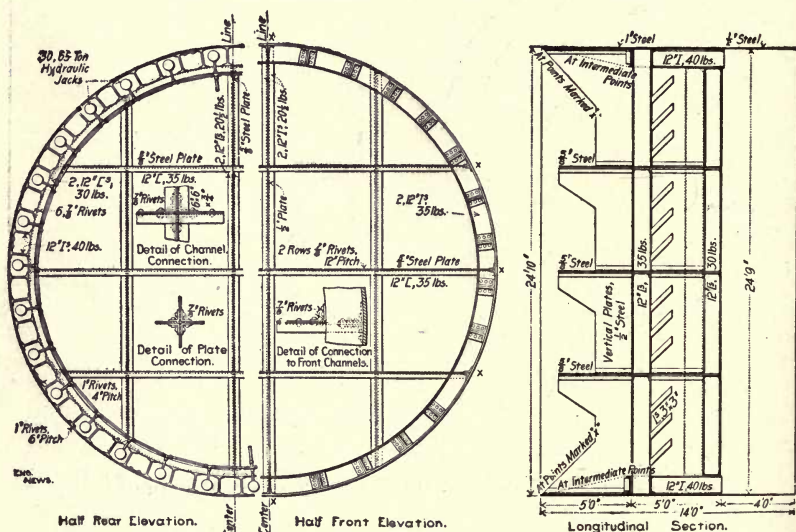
Chicago Sewer Tunnel: The Shankland Shield.
